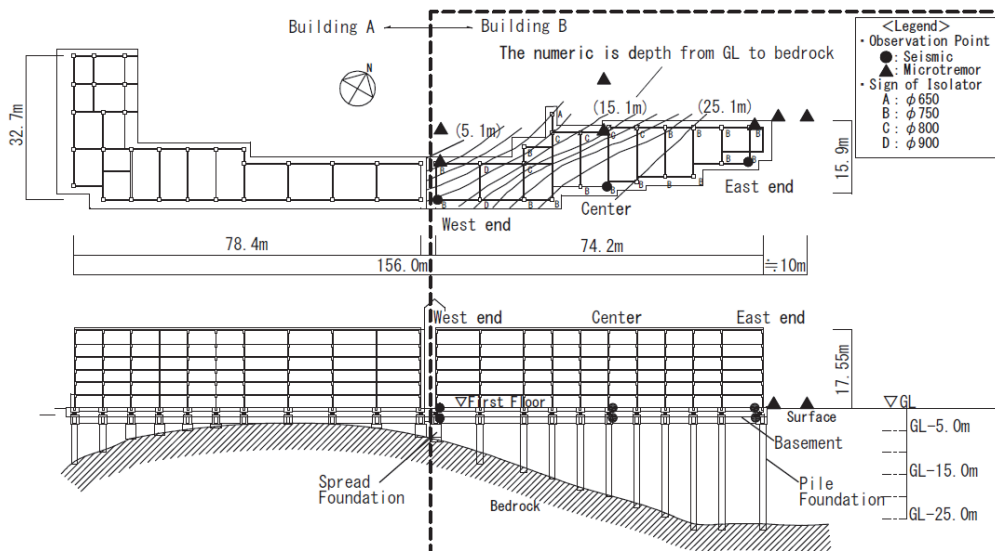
Plan and cross-sectional schematics of the building and seismic observation points
